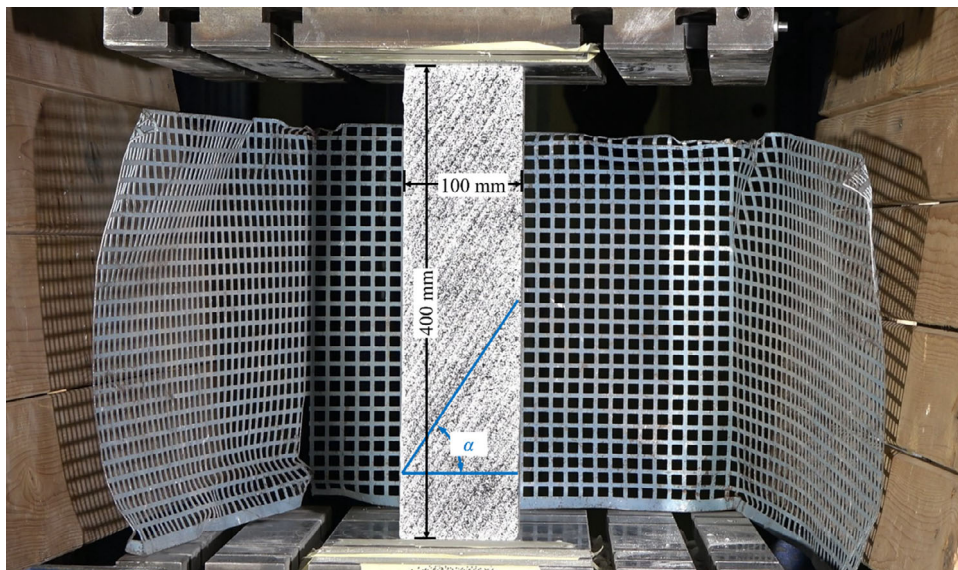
Test setup of the modified slant shear test for 3D printed concrete.
